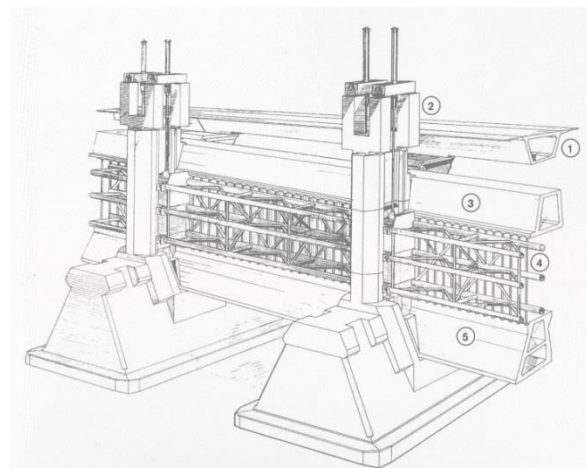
Construction drawing of the Oosterschelde storm surge barrier: 1 road structure; 2 superstructure with lifting tackle; 3 upper beam; 4 steel door construction; 5 threshold beam. After Steenhuis 2016.
